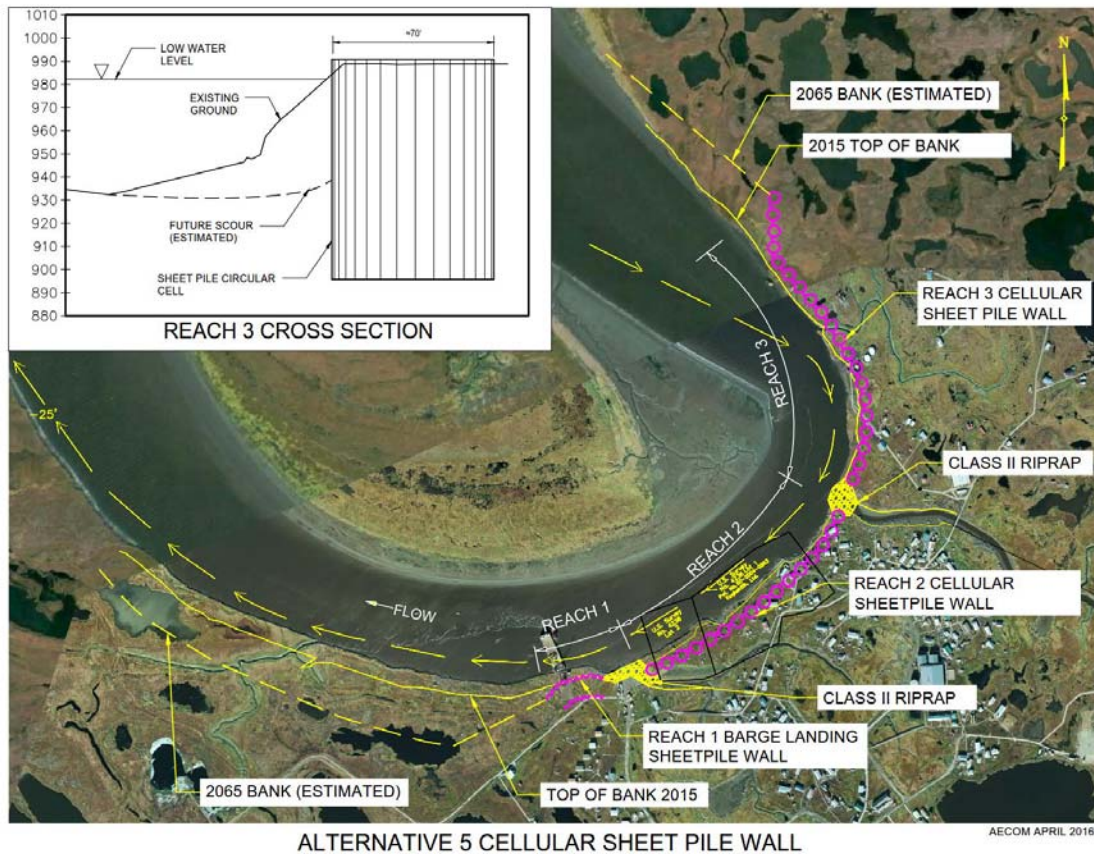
Alternative 5 Cellular Sheet Pile Wall
